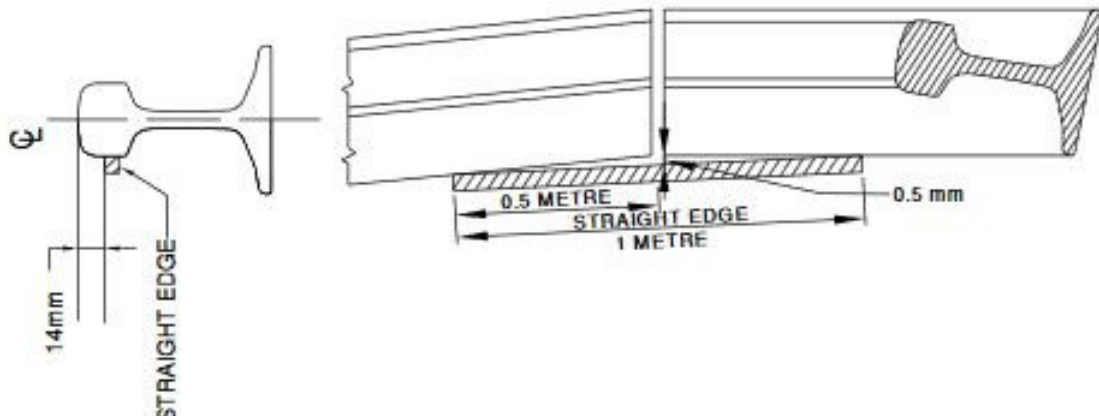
(b) TOLERANCE FOR LATERAL MISALIGNMENT AT THE TIME OF WELDING
